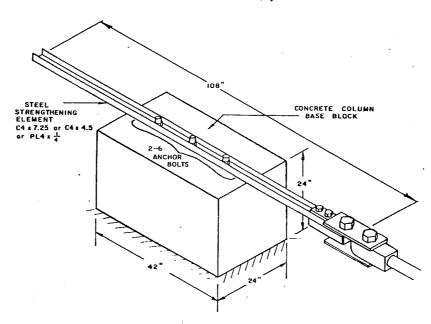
Test setup used in previous research on steel-to-concrete connections (Ref. 45)
